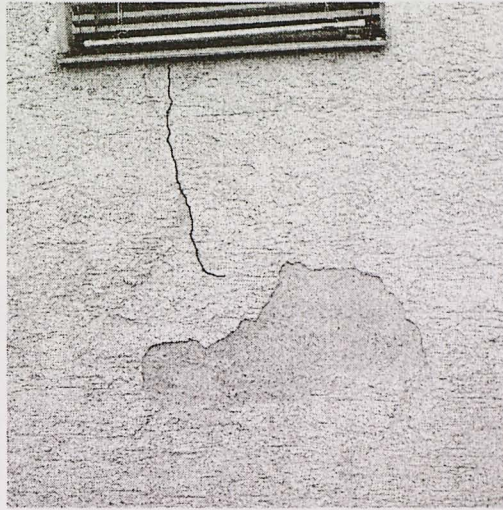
Crack in the wall and damage of plaster on the western façade of the neighbouring building of object 32 without an External Wall Insulation System (Ebertstraße 2). A crack in the wall below the window is occurring in the plaster. The final rendering has partially separated from the undercoat plaster. Such damage can generally be avoided by means of a thermal insulation composite system with the help of the de-coupling effect of the soft insulation layer as well as plastic additives and the reinforcement of the plaster
